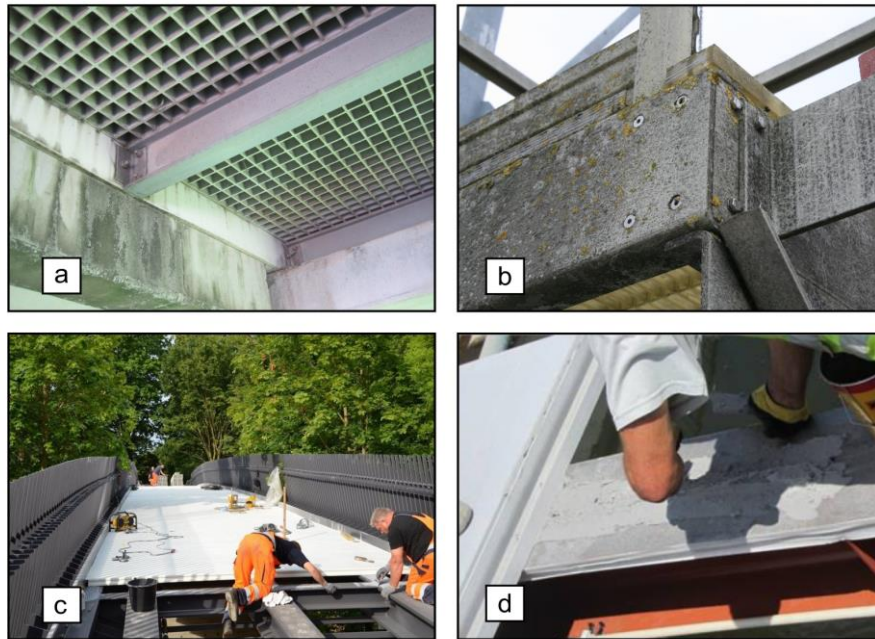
Typical connection types in pultruded GFRP elements; (a) bolted connections from *SATU Oeiras*, (b) bolted connections in Vilamoura water treatment facility, (c) bonded connection of Fiberline FBD 300 bridge deck [2.19], and (d) bonded connections between a GFRP bridge deck panel and steel girders (courtesy of Mário Sá [2.34]).
